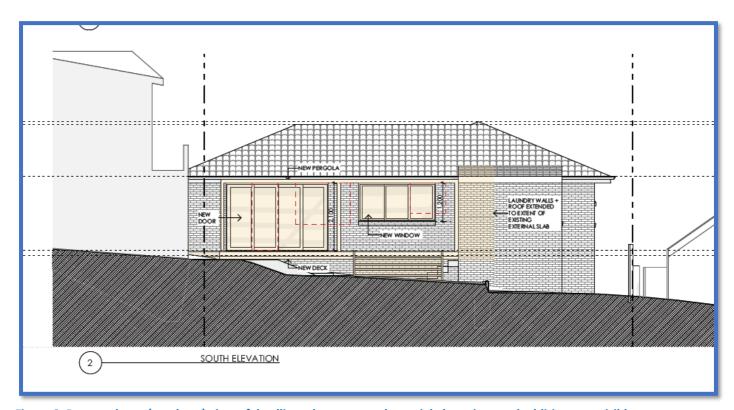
Proposed rear (southern) view of dwelling where most substantial alterations and additions are visible.
